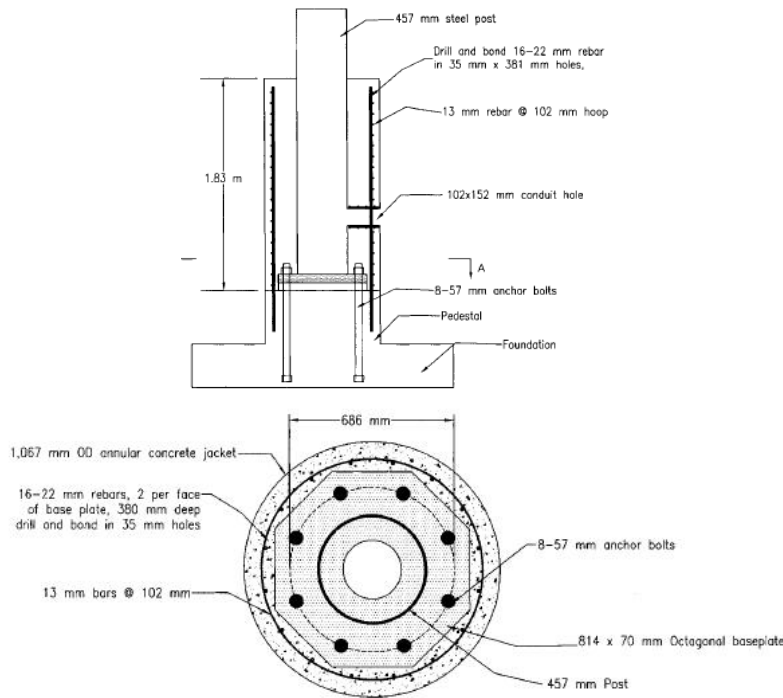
Profile and plan of CJP welded pole-to-base plate connection with concrete jacket (Gilani and Whittaker, 2000b)
